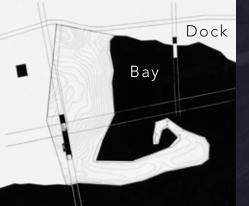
(Above): (Howard House, n.d.) The Howard House is a wedge shaped building that points out towards the sea in West Pennant, Nova Scotia.
